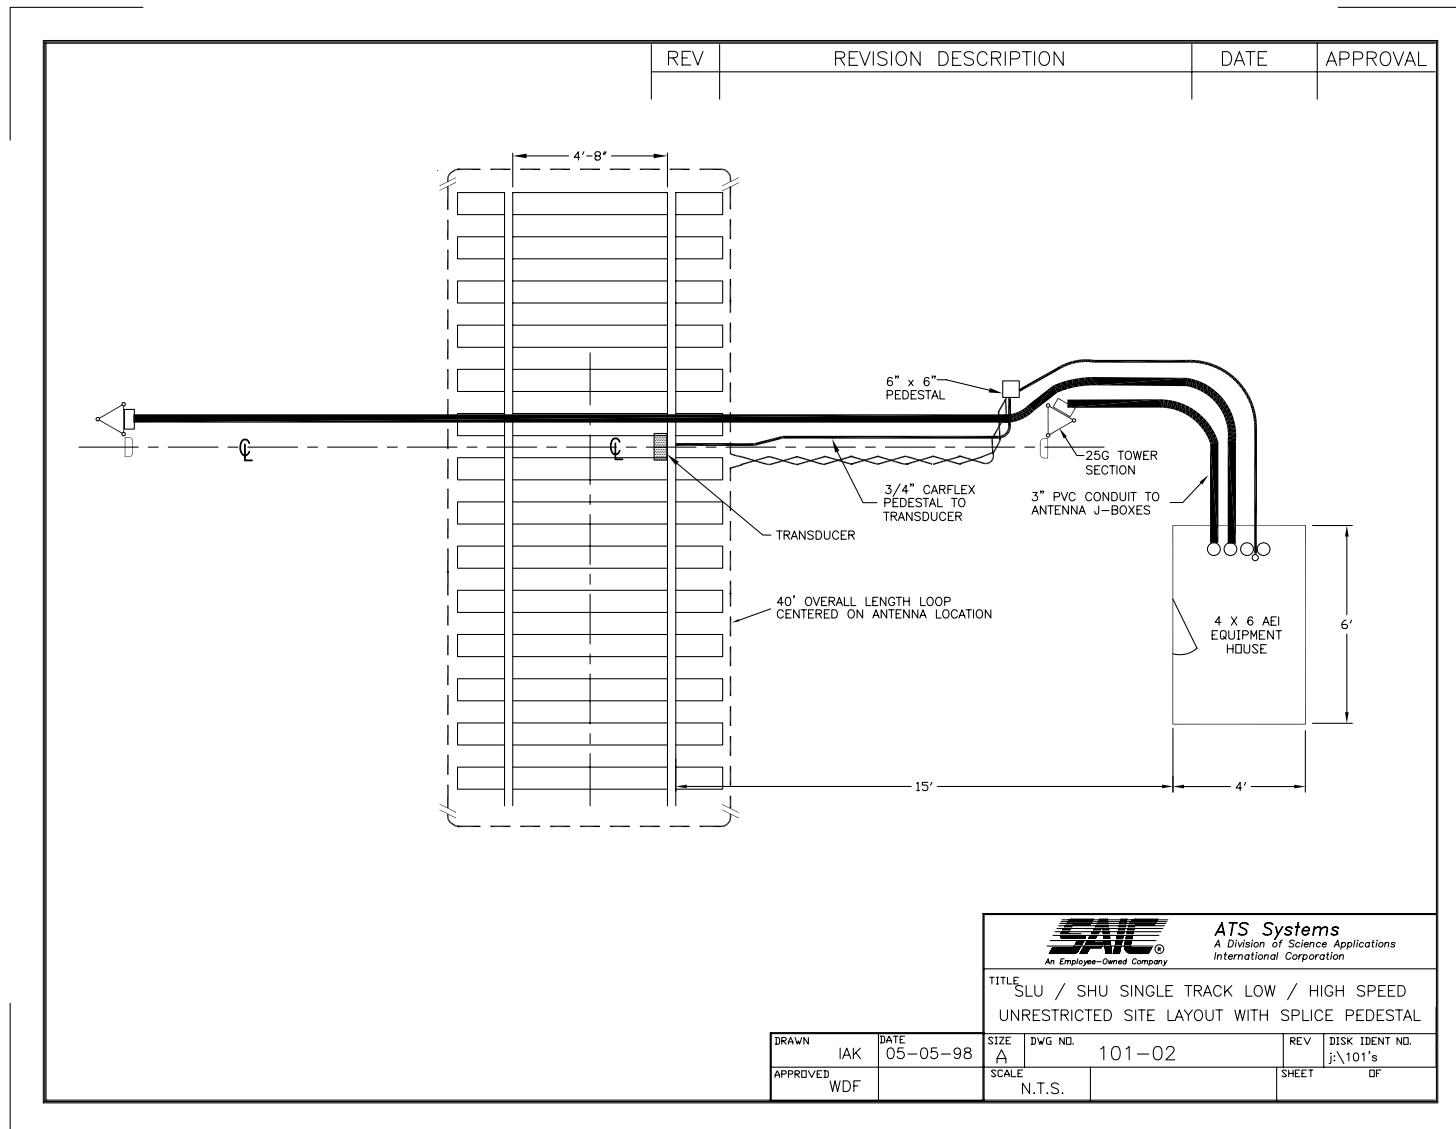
SLU/SHU Single Track Low/High Speed Unrestricted Site Layout With Splice Pedestal
